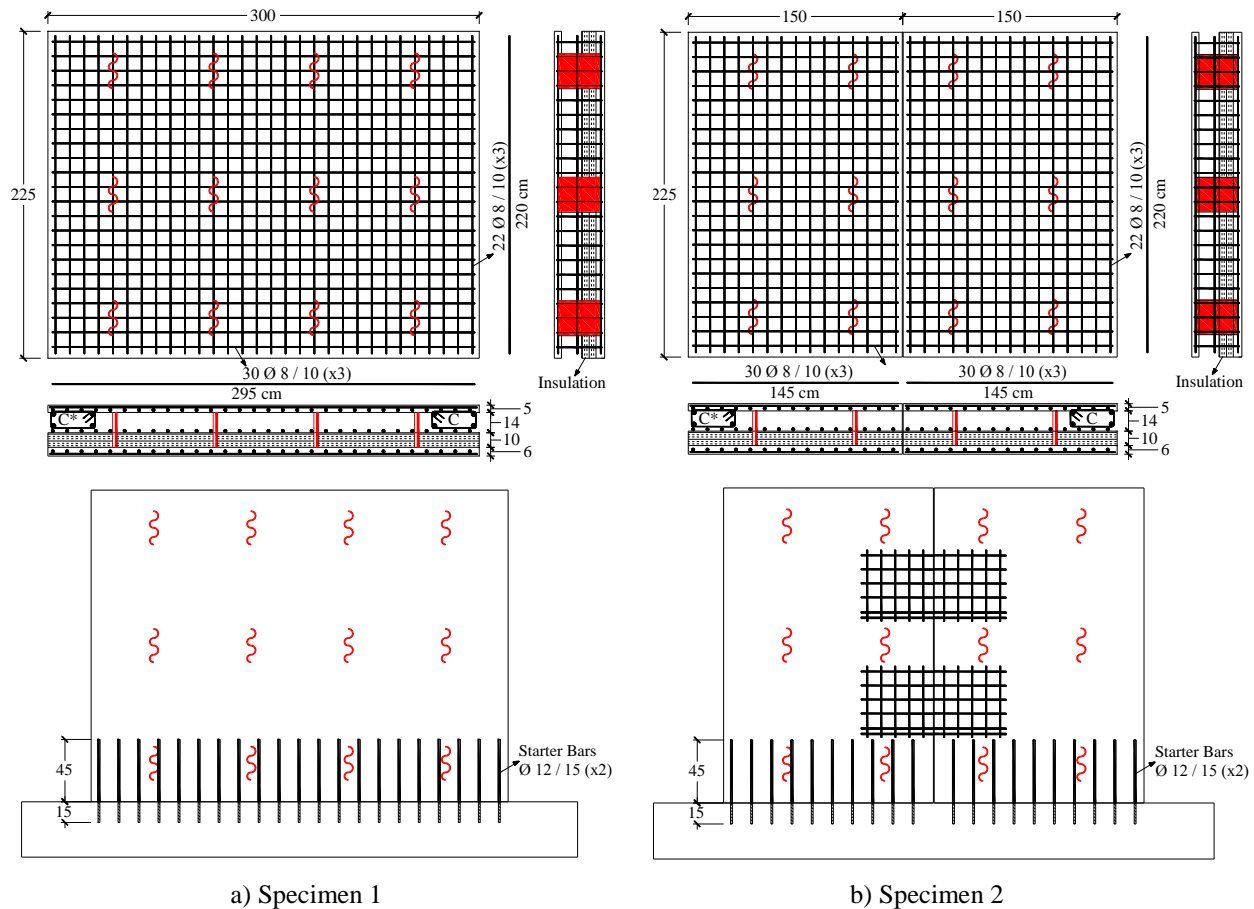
Reinforcement drawings of (a) Specimen 1 and (b) Specimen 2
